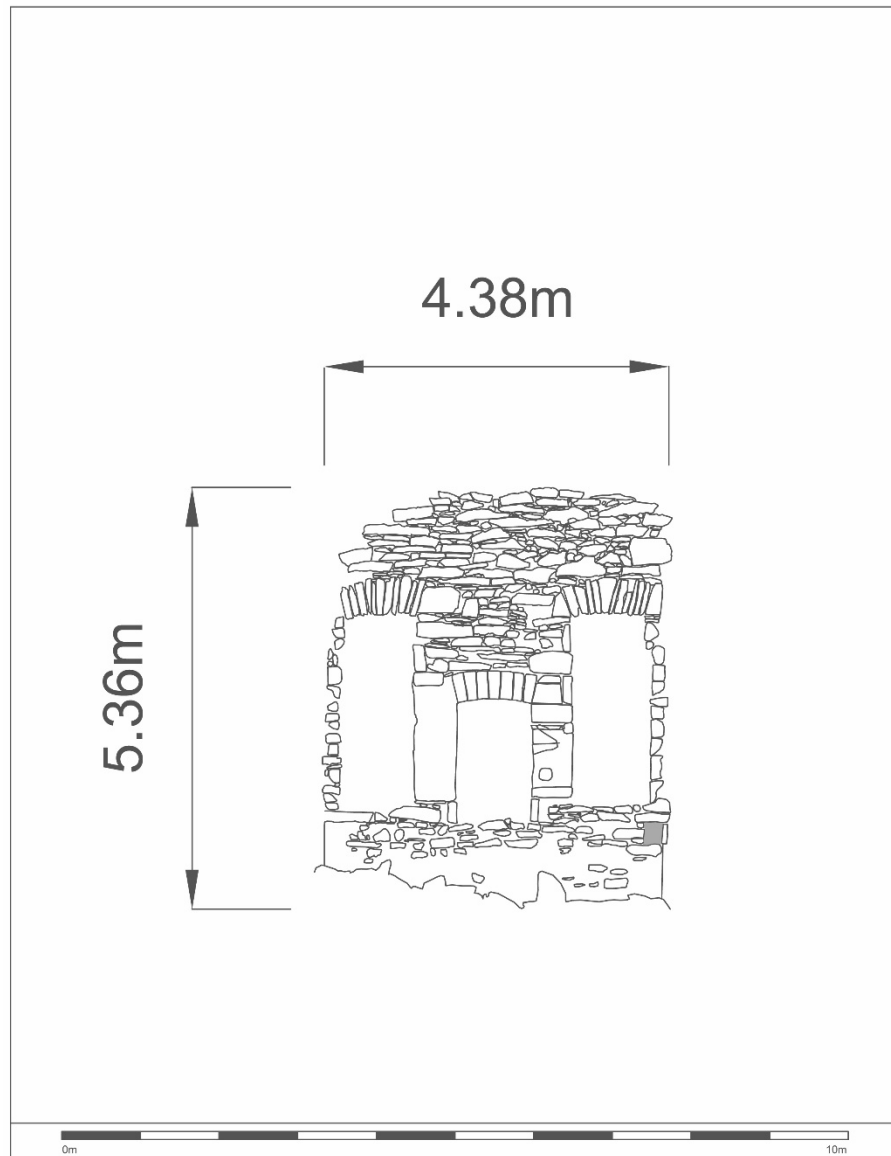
Internal elevation of the east wall of Saddle Hill Signal Tower. The higher of the two chute is shown, shaded grey, at the south edge of the wall at the top of the semi-basement level. The second chute emerges in the base of the north alcove and cannot be seen in the elevation.
